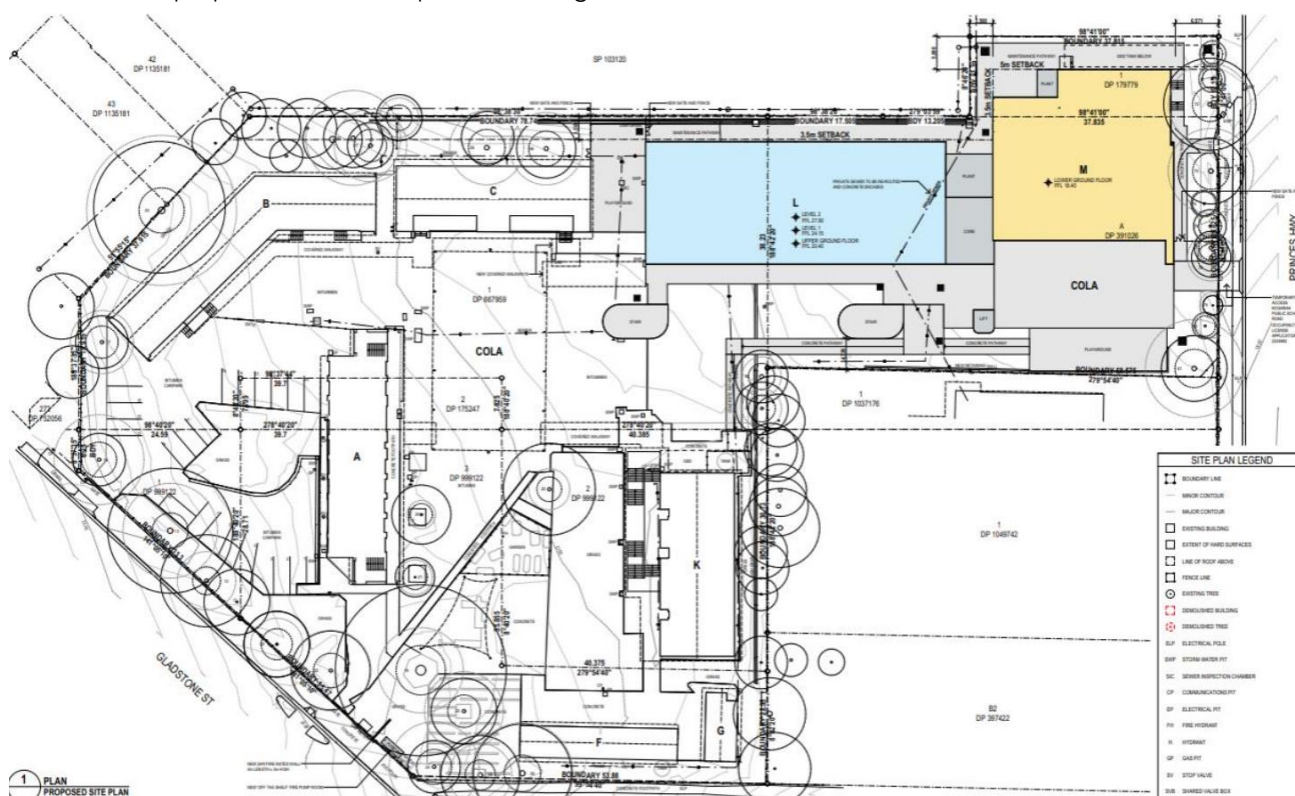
EXTRACT OF PROPOSED SITE PLAN
